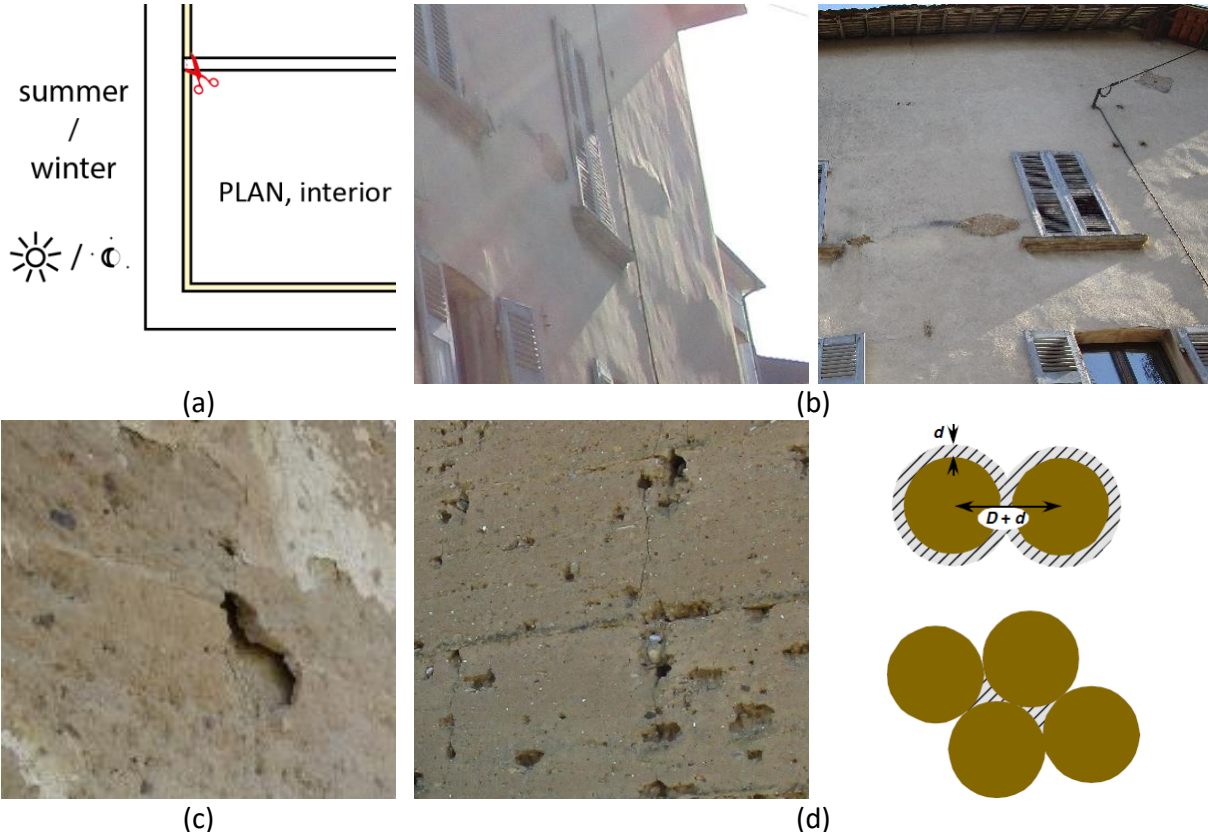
(a) Thermal working of load-bearing construction and its tearing off and down; (b) differential working of rammed earth wall and plaster layer upon (hygro)thermal loading, delamination and cracking of plaster, wind-driven rain water infiltration, and blistering and bursting of plaster and increased hygric loading of rammed earth surface; (c) clay swelling and shear and buckling; (d) local out-of-plane or microscopic clay swelling damage (Scherer, 2006).
